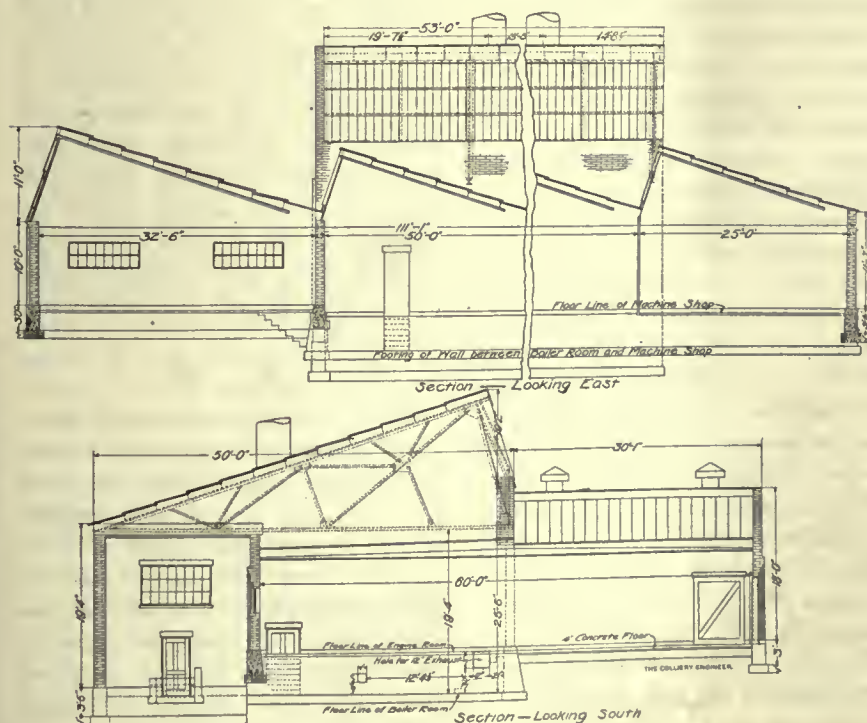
SHOWING CONSTRUCTION OF SAW-TOOTH BUILDINGS
